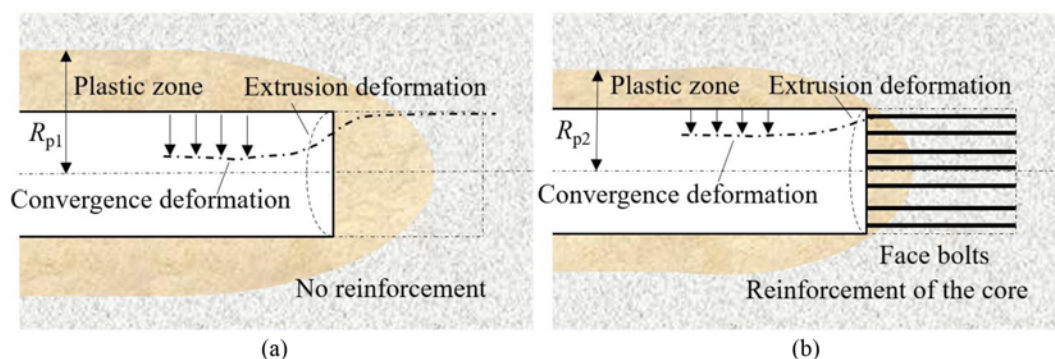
Extrusion and Convergence Deformation of the Tunnel: (a) No Reinforcement, (b) Reinforcement of Core
